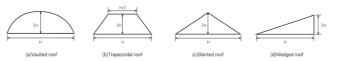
Schematic diagram of four different roof shapes Source: Yuan-dong Huang,2015
